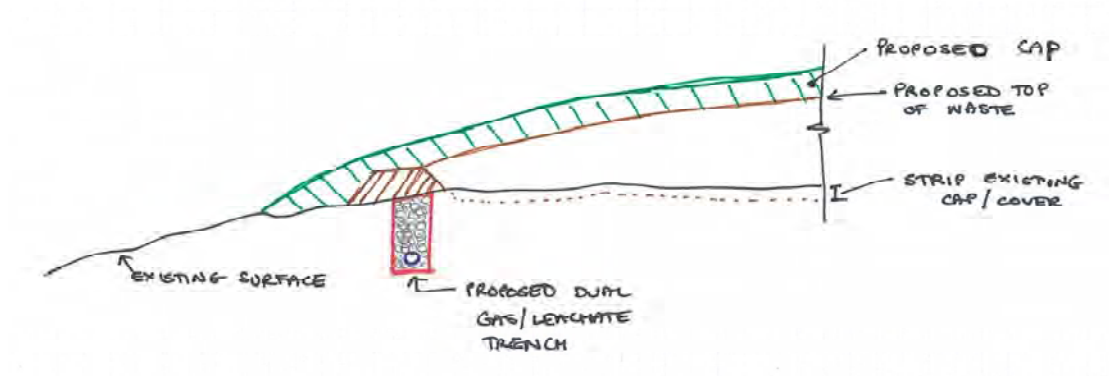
Proposed dual gas/leachate trench typical arrangement
